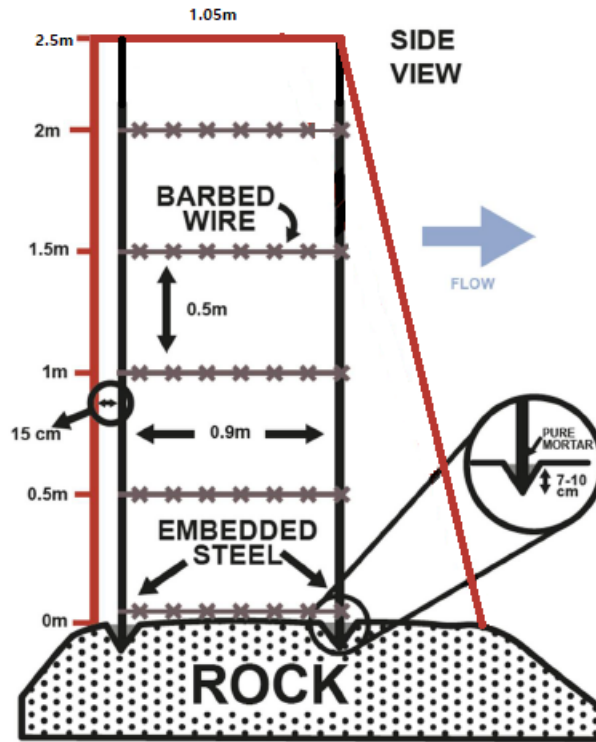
Concrete wall side view (modified from Maddrell, 2018).
